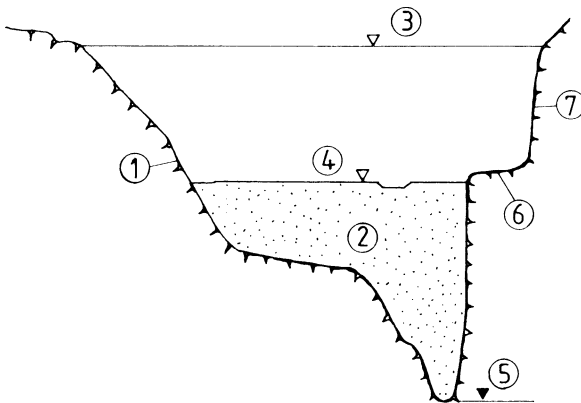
Sylvenstein dam, valley section (adapted from Lorenz 1966).
